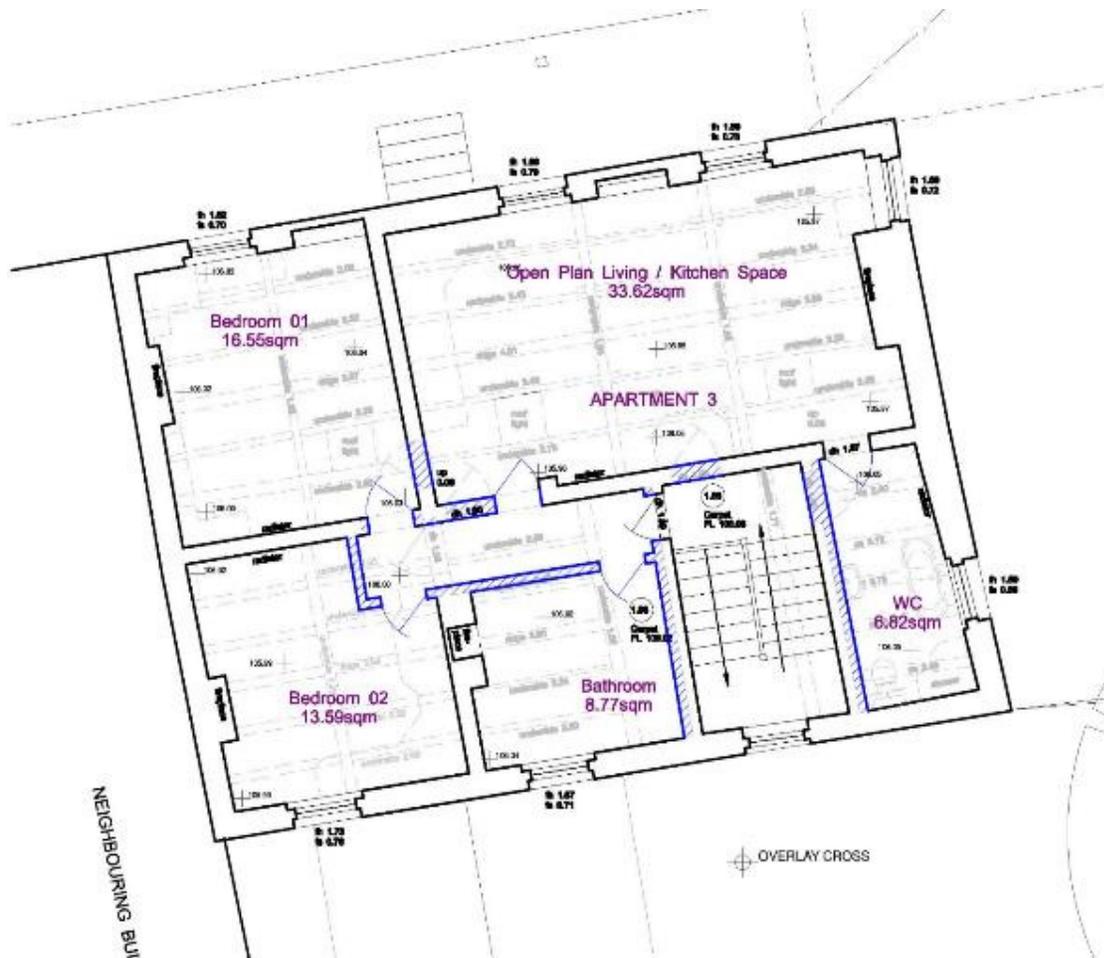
Proposed Second Floor Plan (close up) showing proposed alterations.
